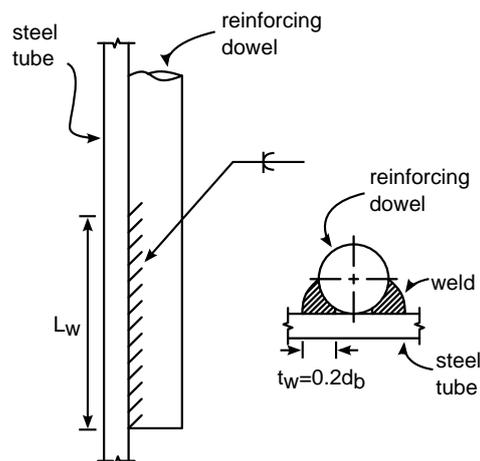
Flare Bevel Groove Weld
